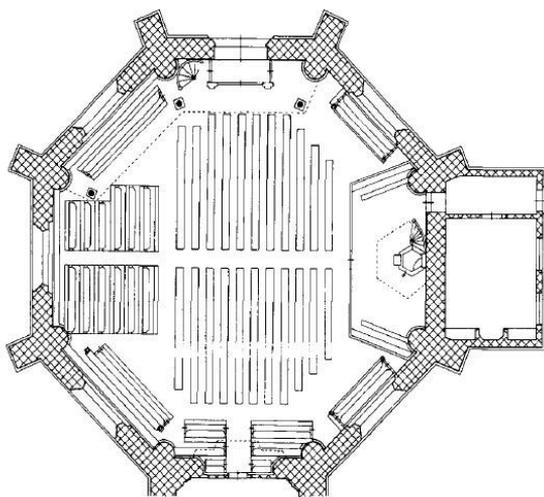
Willemstad plan, 1597. Source from *T. Brouwer, RDMZ*.
